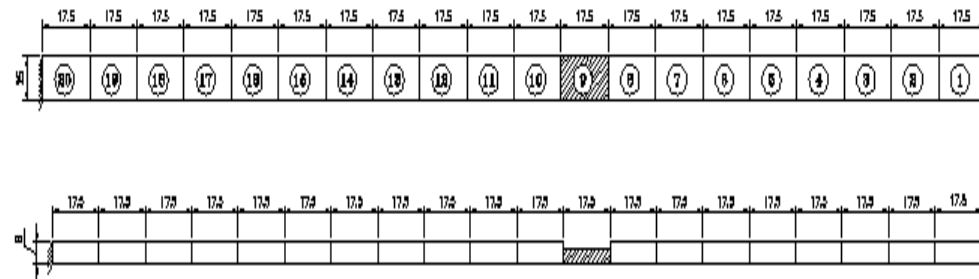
Plan and elevation of damaged (single element-ID9) cantilever beam.
